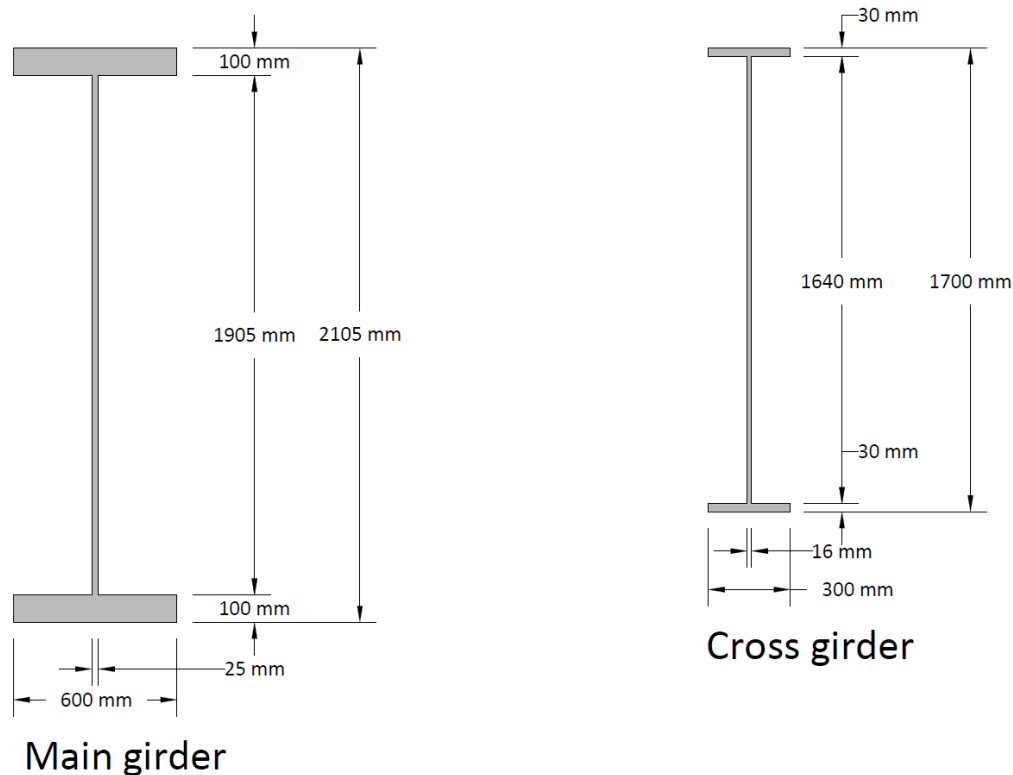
Cross sections of the main and cross girders – non-hybrid
